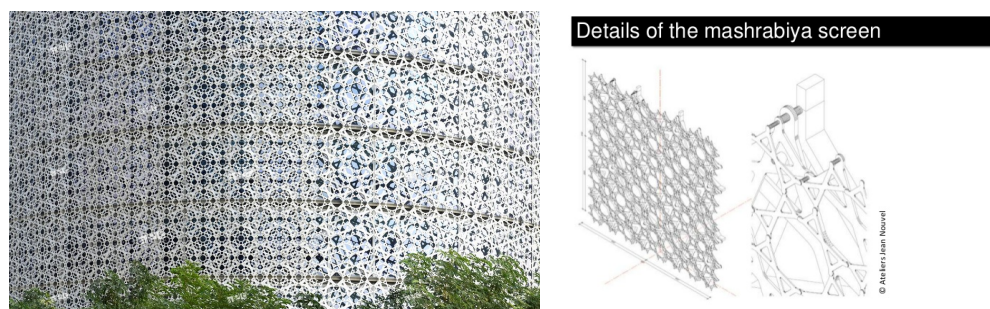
Example on Doha tower that used double façade Mashrabiya style system.
